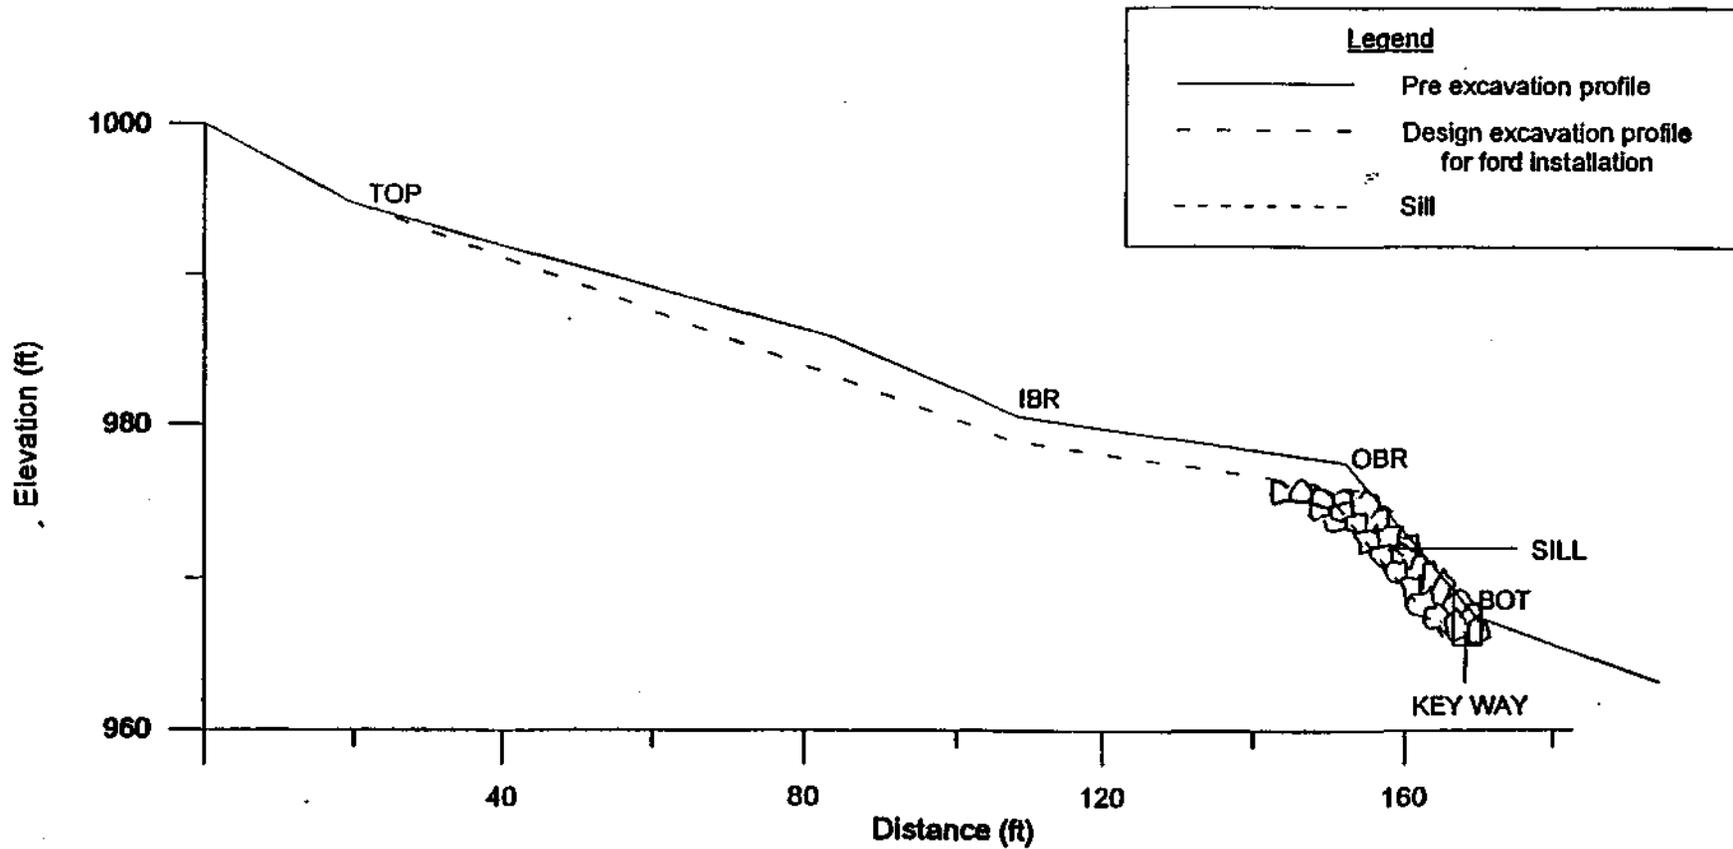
Butler Road: Site 10 Stream Crossing Pre & Design Excavation Profiles.
